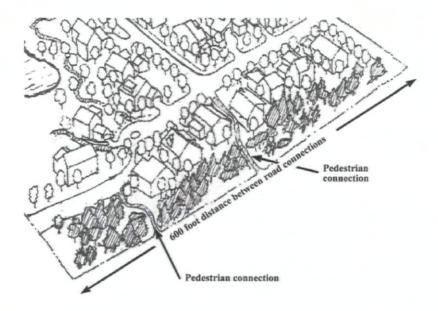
Pedestrian connections provided between 600' distanced road connections
